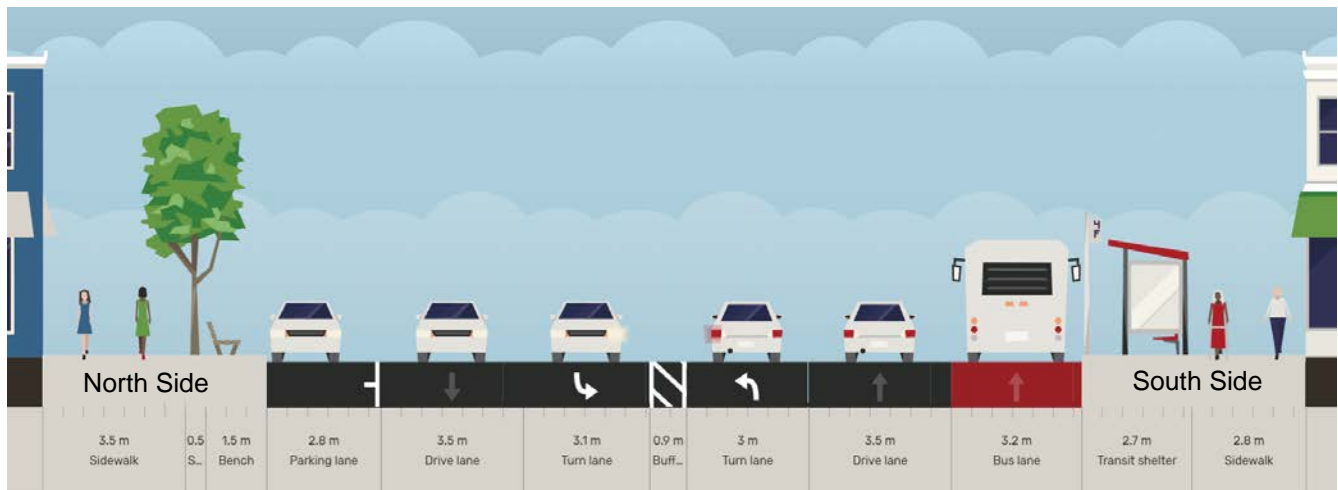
Option 2 Cross-section at John Street, Looking East
